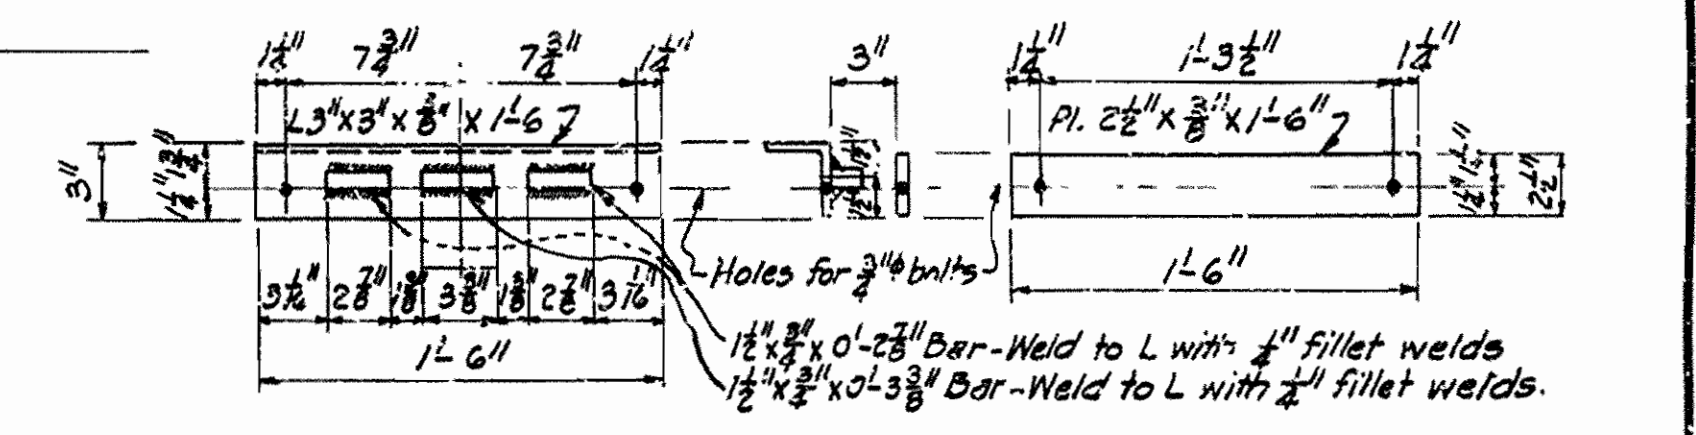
DETAILS OF CONNECTIONS OF EYE BARS TO CABLES
